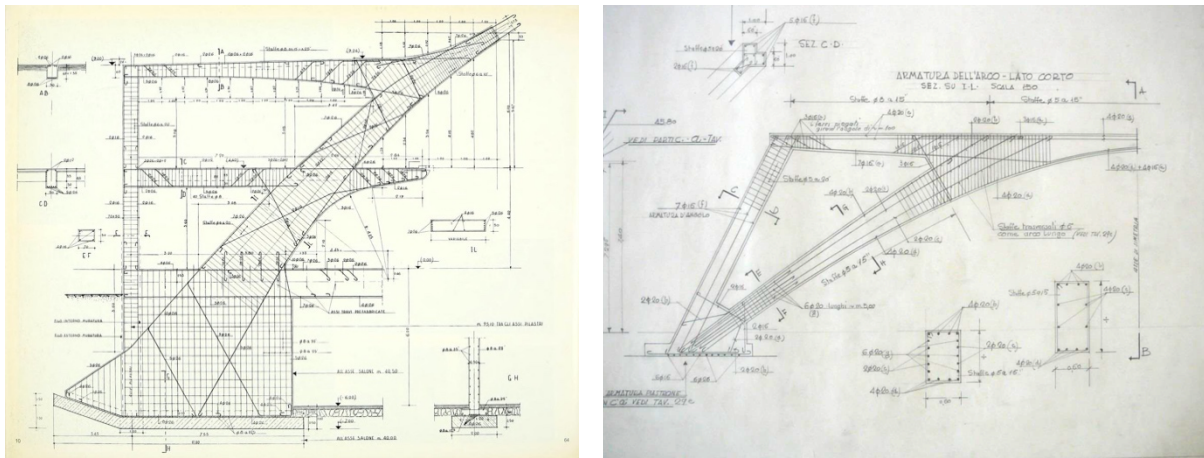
Original drawings reporting the details of the reinforcements of the slanted pillars of Hall B (on the left) [14], and shorter inclined arch of Hall C (on the right) [15].
